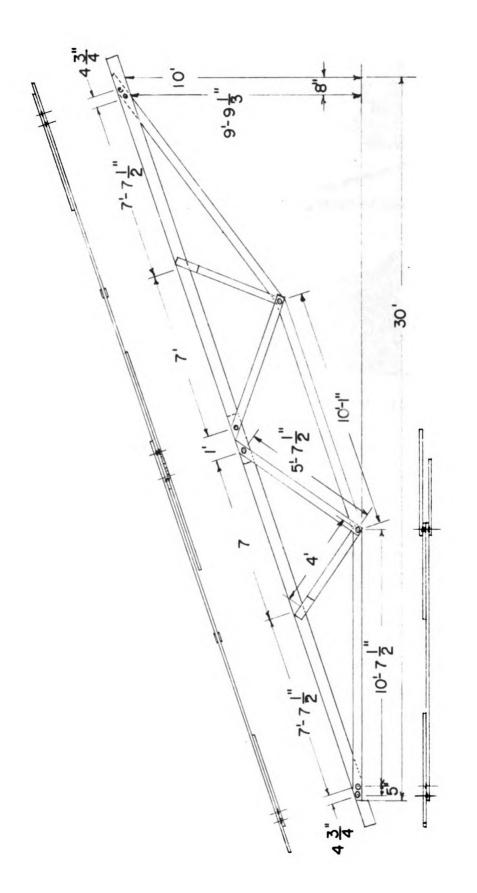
TRUSS "B"-RING AND BOLT FASTENING DETAILS
